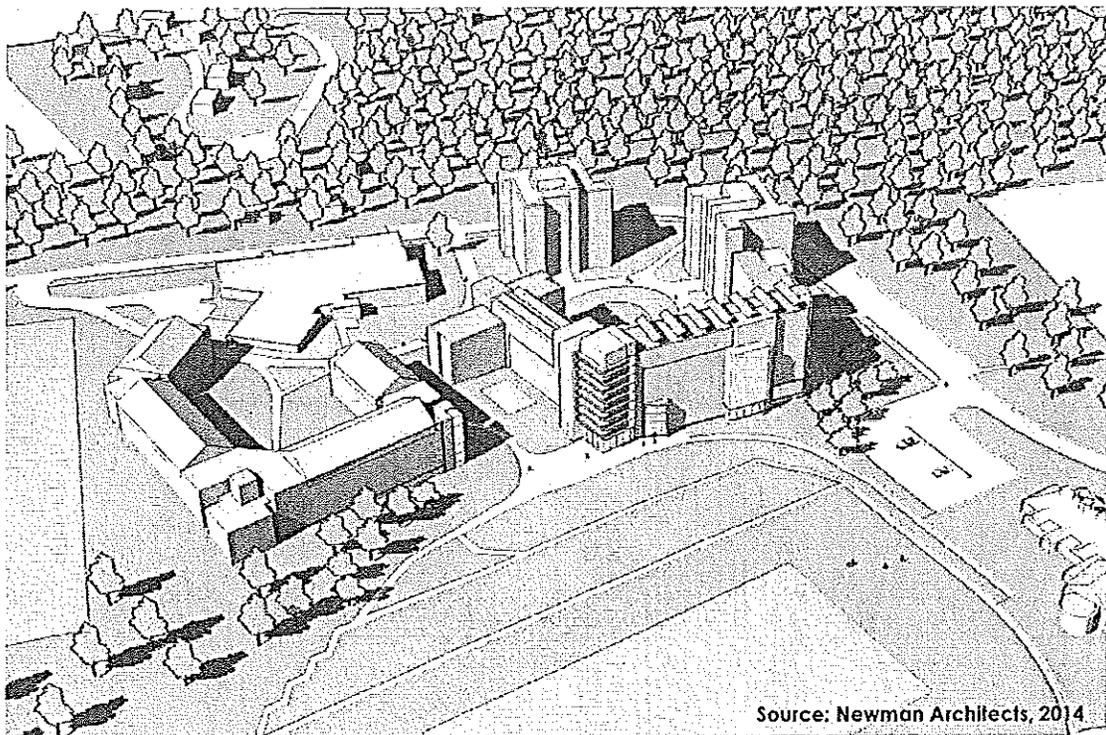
Proposed STEM Residence Hall Architectural Rendering Facing West
